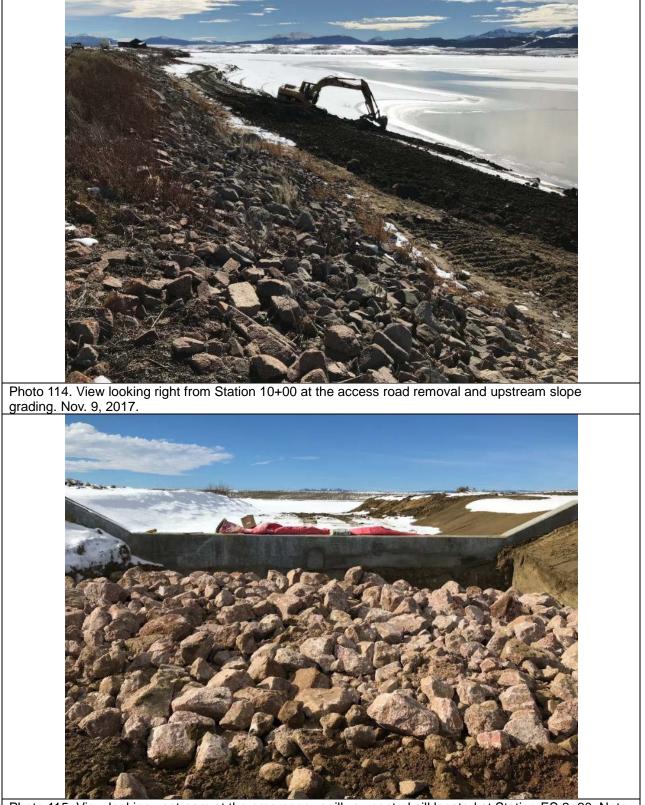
View looking upstream at the emergency spillway control sill located at Station ES 2+20. Note that the bedding and riprap has been installed downstream of the cutoff structure. Nov. 9, 2017.
